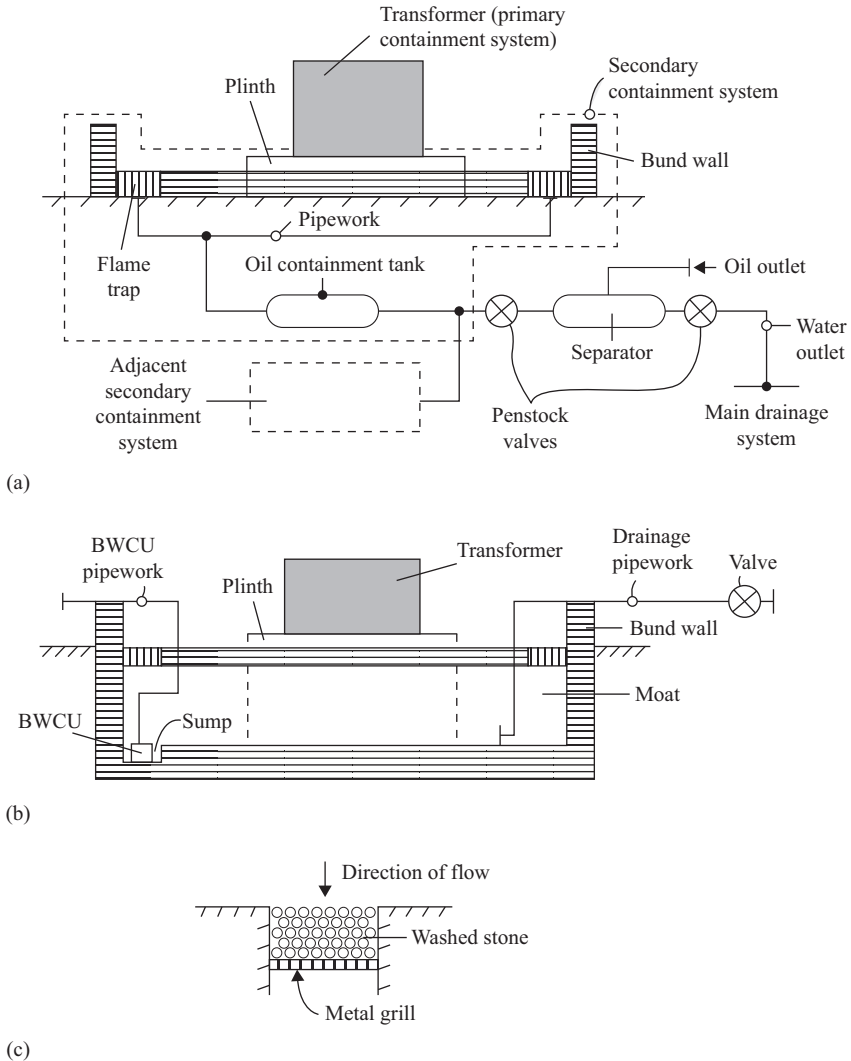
Oily water drainage system: (a) oil containment tank, (b) moat type containment system and (c) flame trap example
